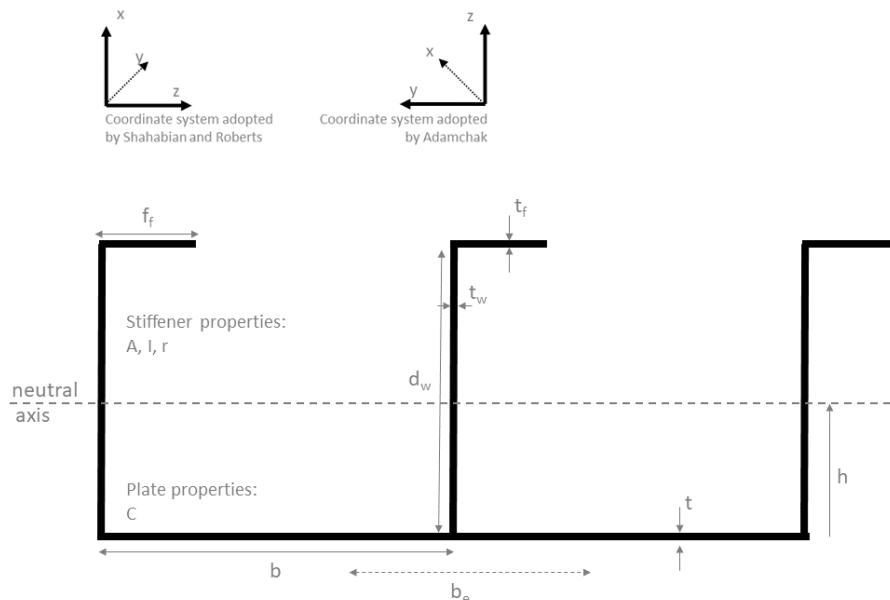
Cross-section of steel stiffened panel with three HP-stiffeners.
